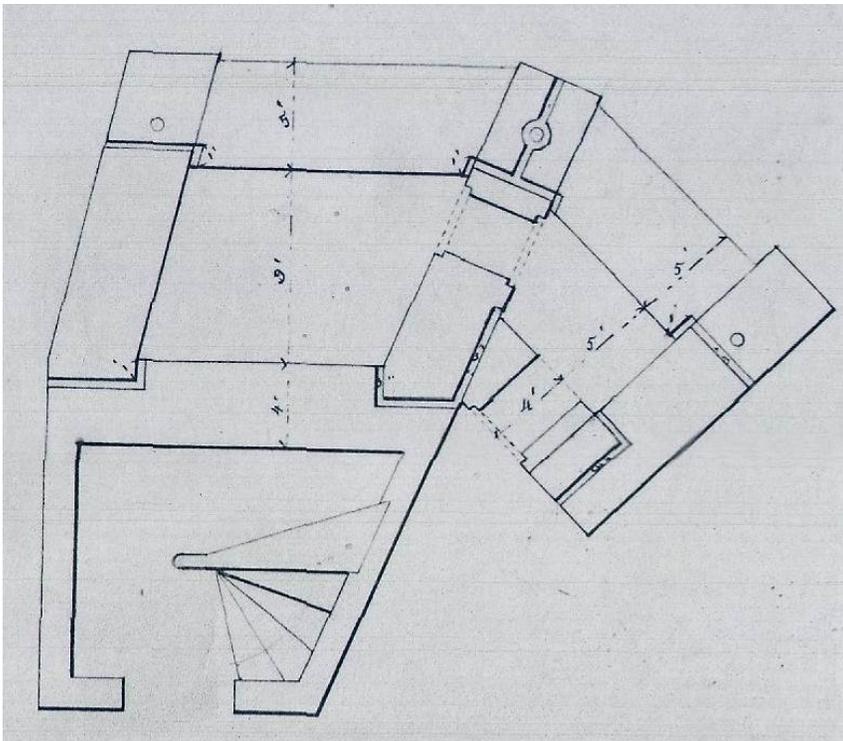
Original plan shows drainage downspouts and air channels in masonry walls
